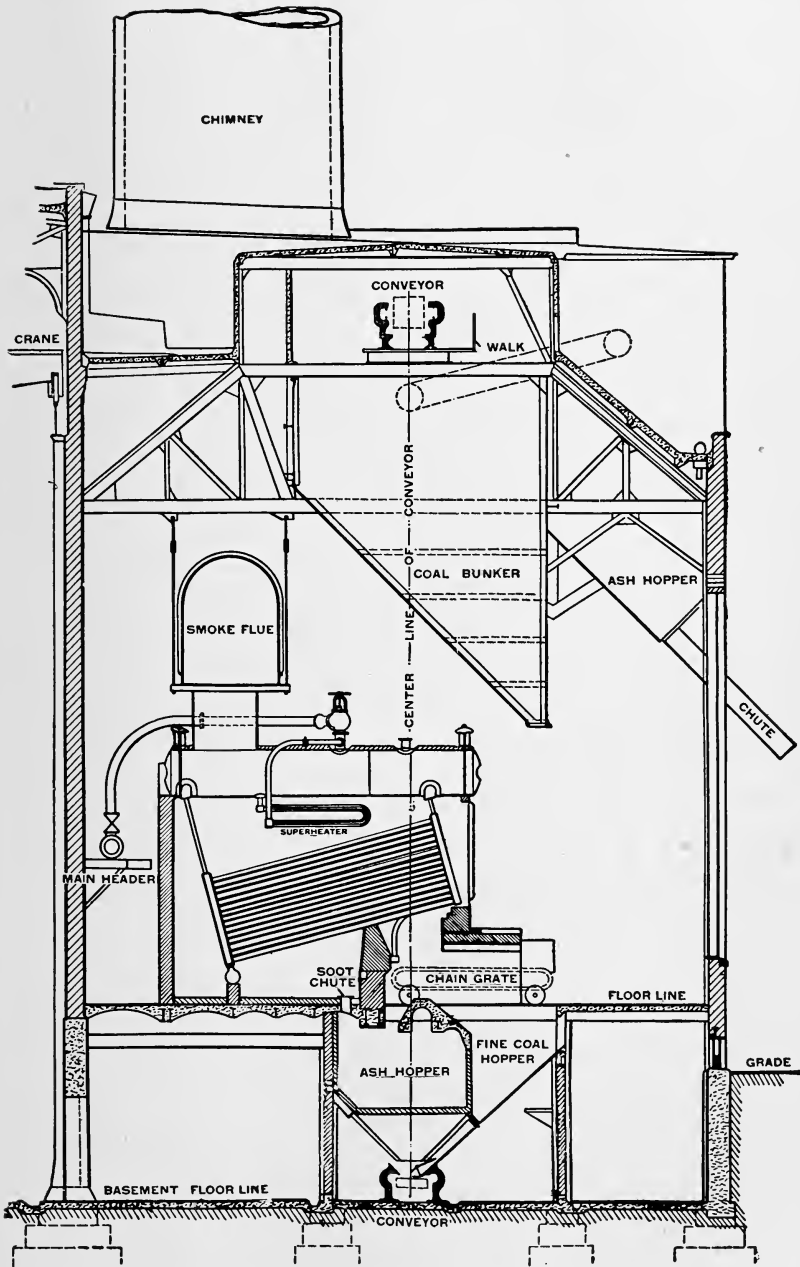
Coal and Ash-handling System in the Power House of the South Side Elevated Railway Company, Chicago.
